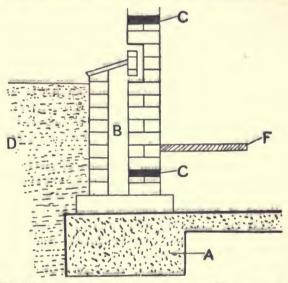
Diagram showing Foundations and Wall of a Building with a Dry Area installed to prevent the Access of Water from the Outside Soil.
